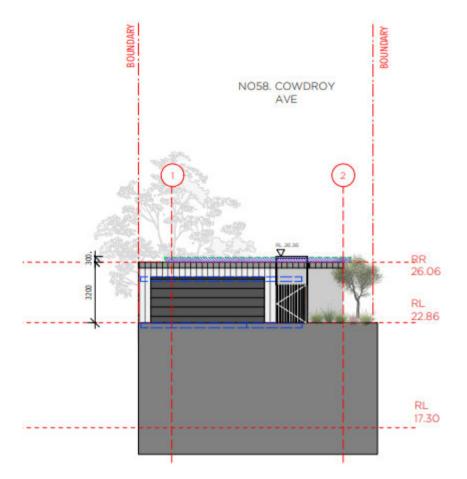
Proposed Amended Southern (Cowdroy Avenue) Elevation
